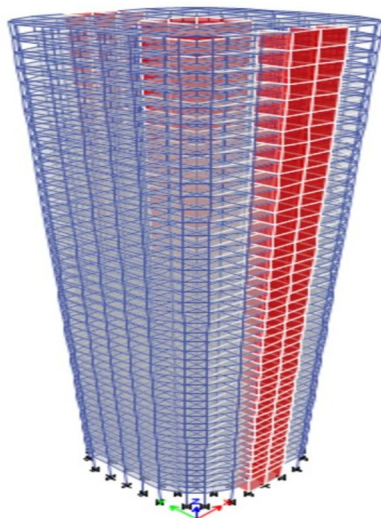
Soft Storey at G floor (storey 1) without LRB
